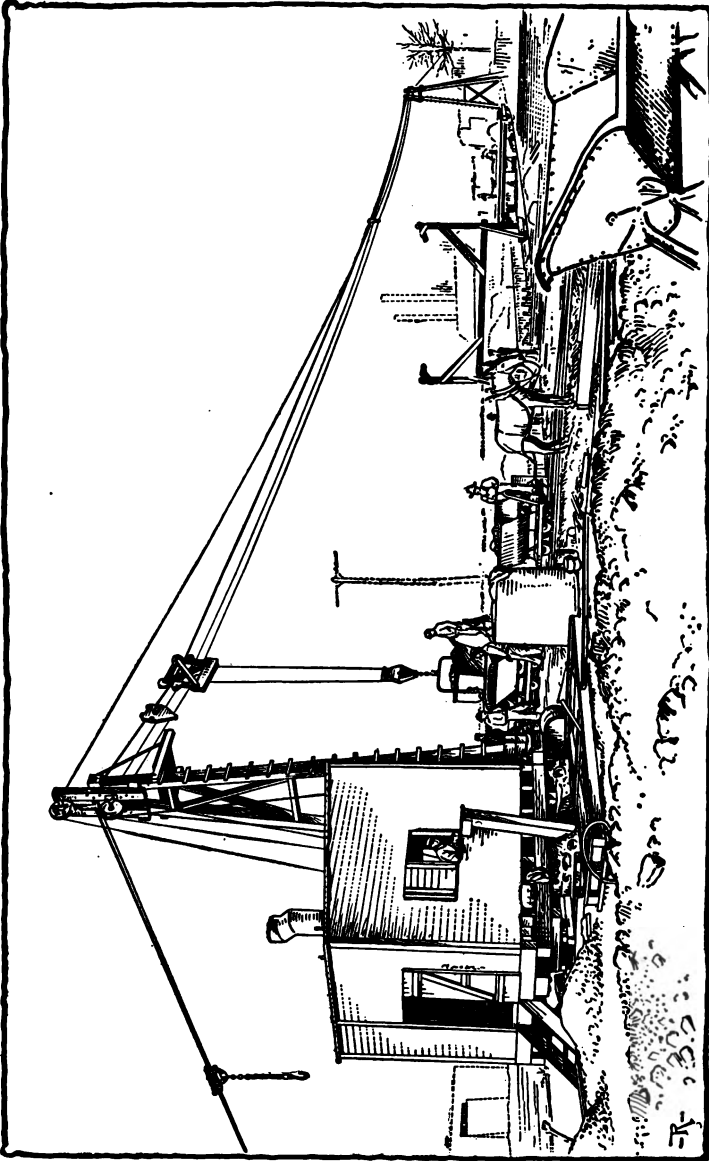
Cableway used on St. Louis sewers (Lambert).
